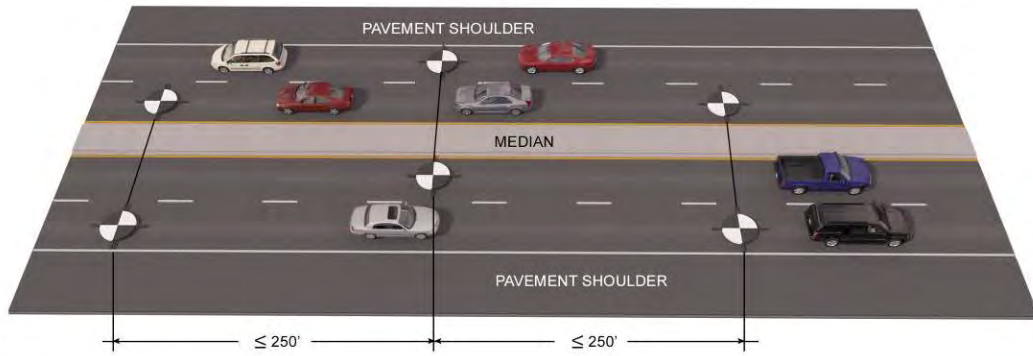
| Example of Soil Test Boring Layout for a Four-Lane Road
